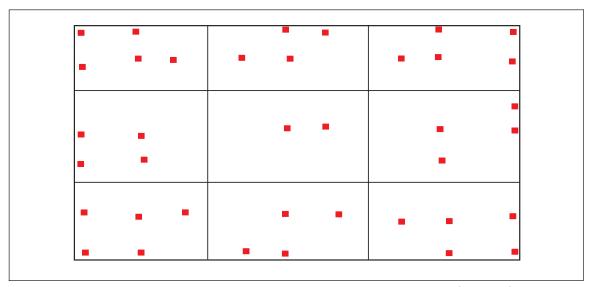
Uplift test location example: nine sections with roof areas up to 60,000 ft<sup>2</sup> (6,000 m<sup>2</sup>) (each ■- approximate test locations)
